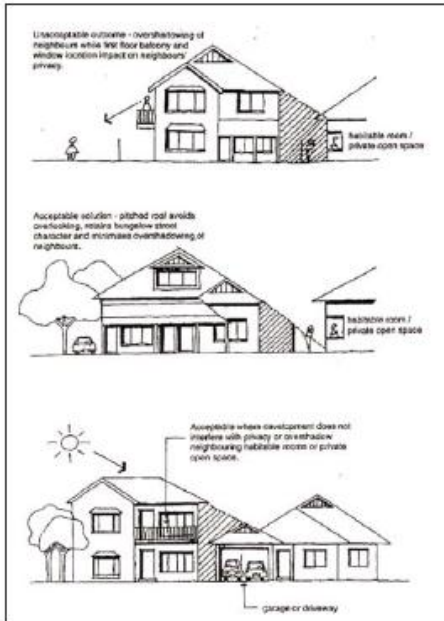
Distributing building bulk to avoid impacts on neighbours.
